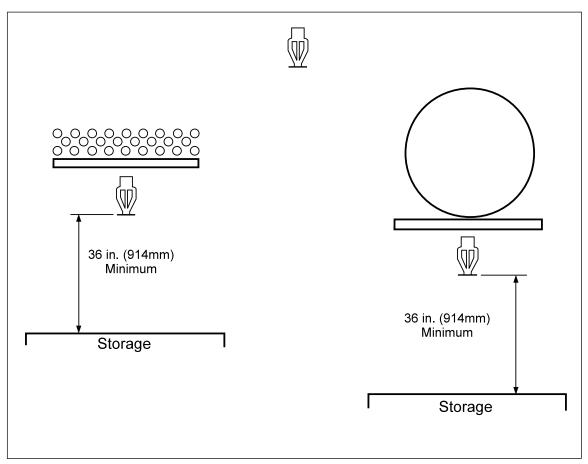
Obstructions below sprinklers wider than 2 ft (610 mm) not flat or not solid.
